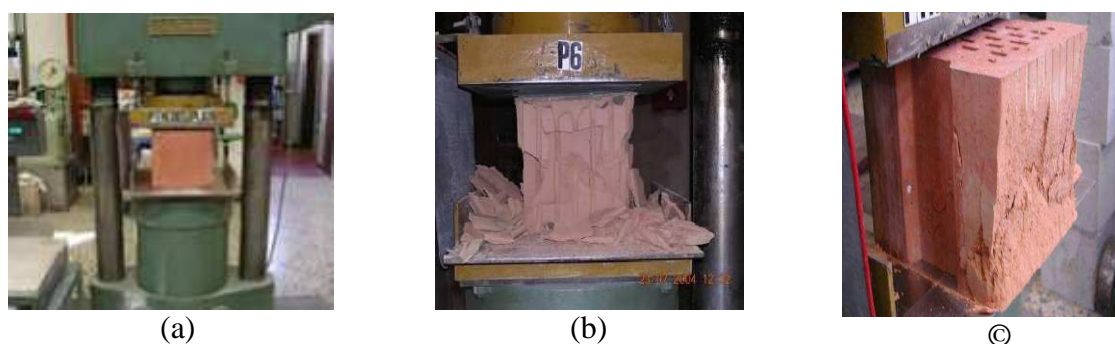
Test of masonry units (da Porto 2003) (a) test setup (b) and (c) specimen after test.
